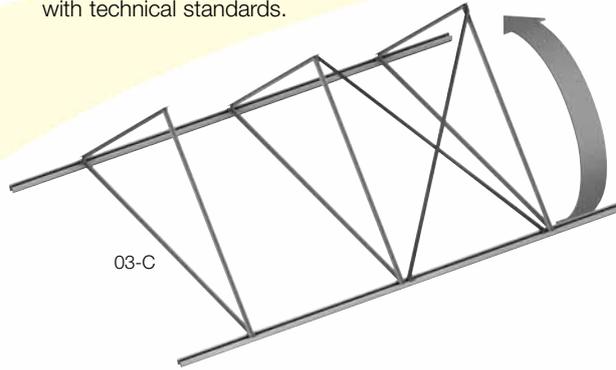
Fixing Additional Flat Roof Mounting Brackets
